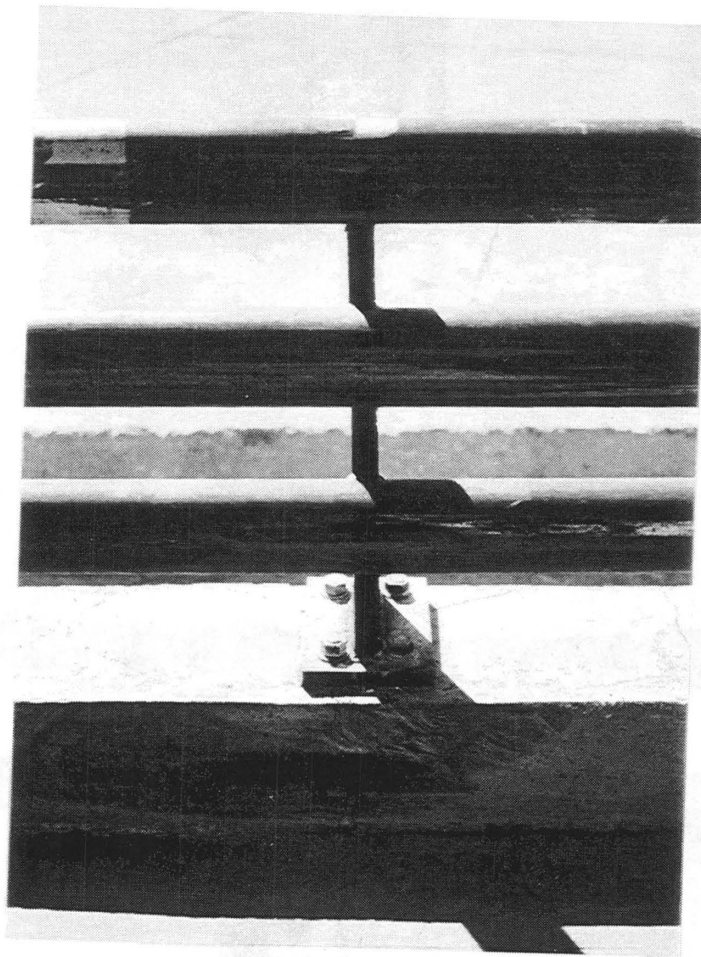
Bridge Rail Damage, Test GWMP-3.
